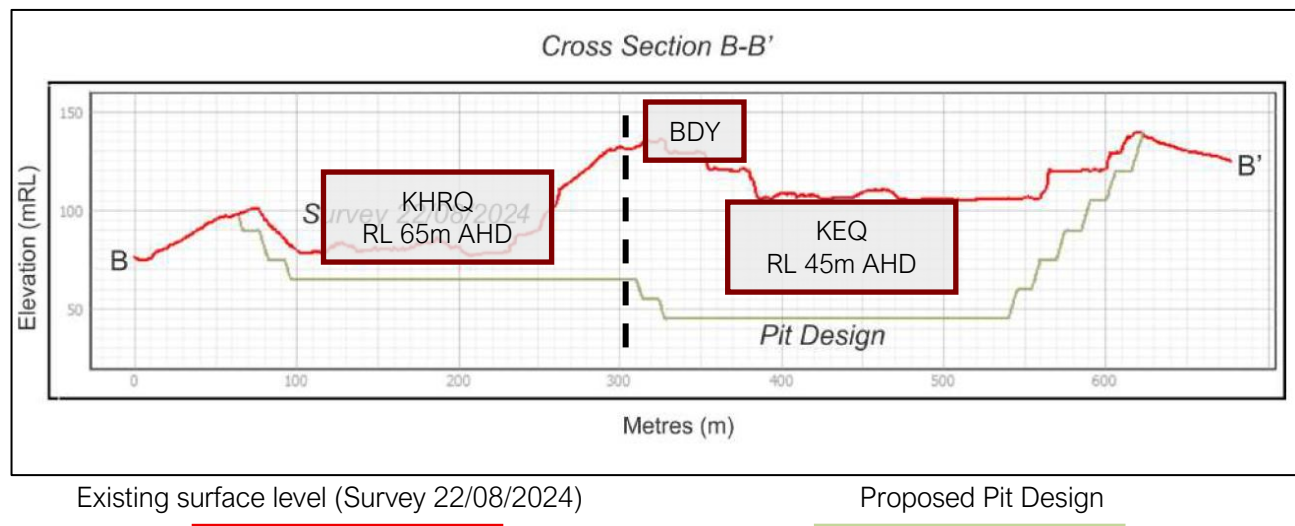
Typical Section of Remnant Dividing Highwall Removal on KEQ/KHRQ Boundary.
